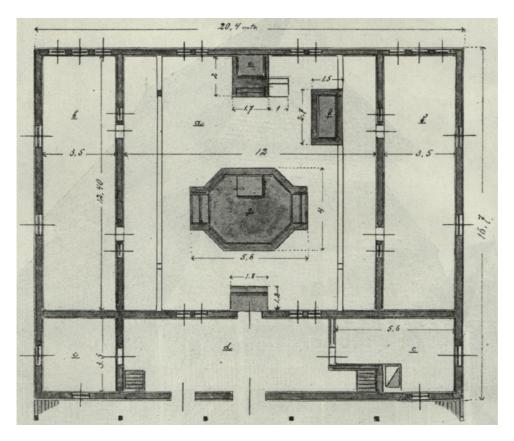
Ground floor plan of the synagogue in Pohrebyshche
